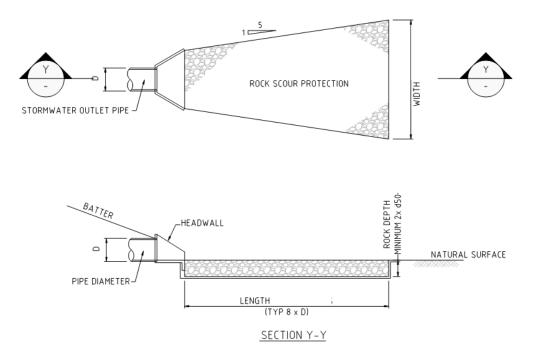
Typical rock scour protection detail for new drainage outfalls.
